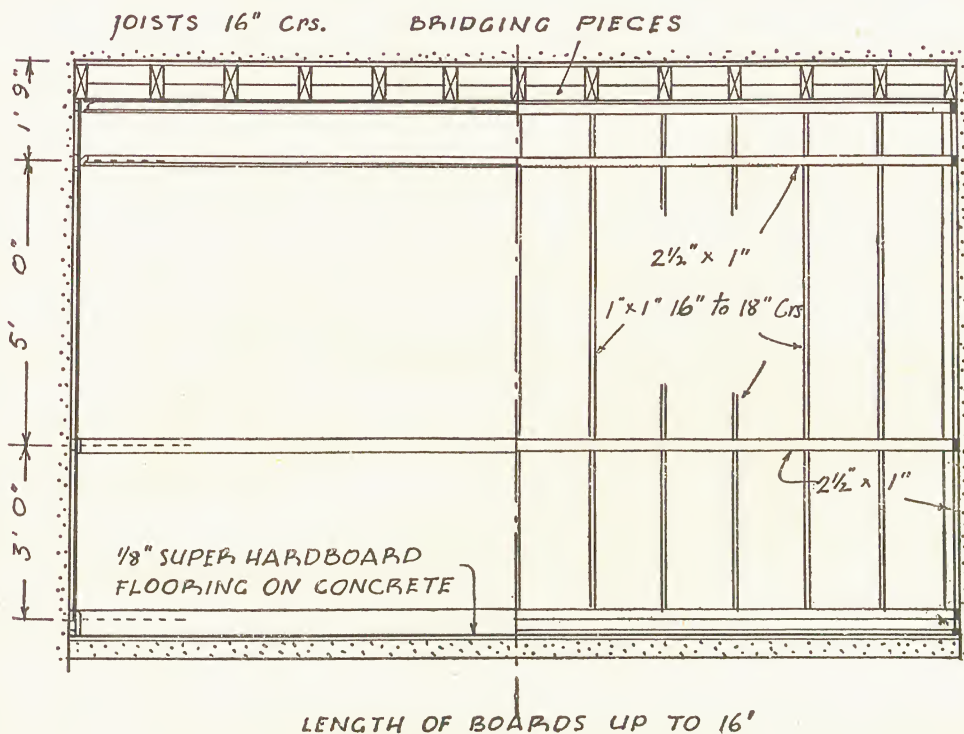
Typical layout for fixing wall-boards horizontally. Vertical joints occur at corners only.
